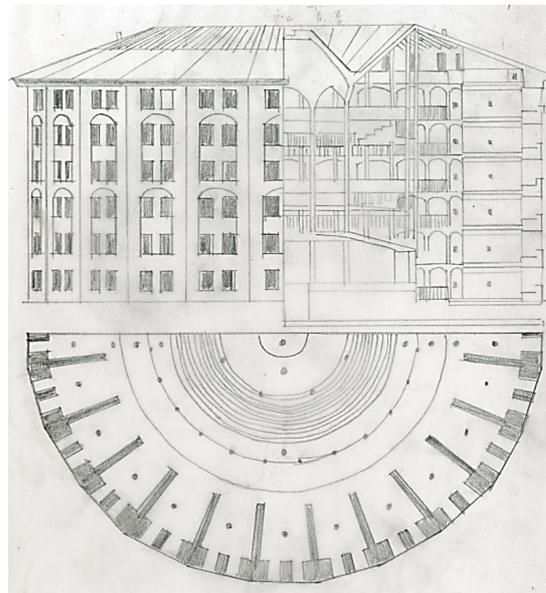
Sketch showing the elevation, section & plan of Jeremy Bentham's Panopticon 'inspection house' (Author's own sketch, based on drawing by Willey Reveley, 1791).
